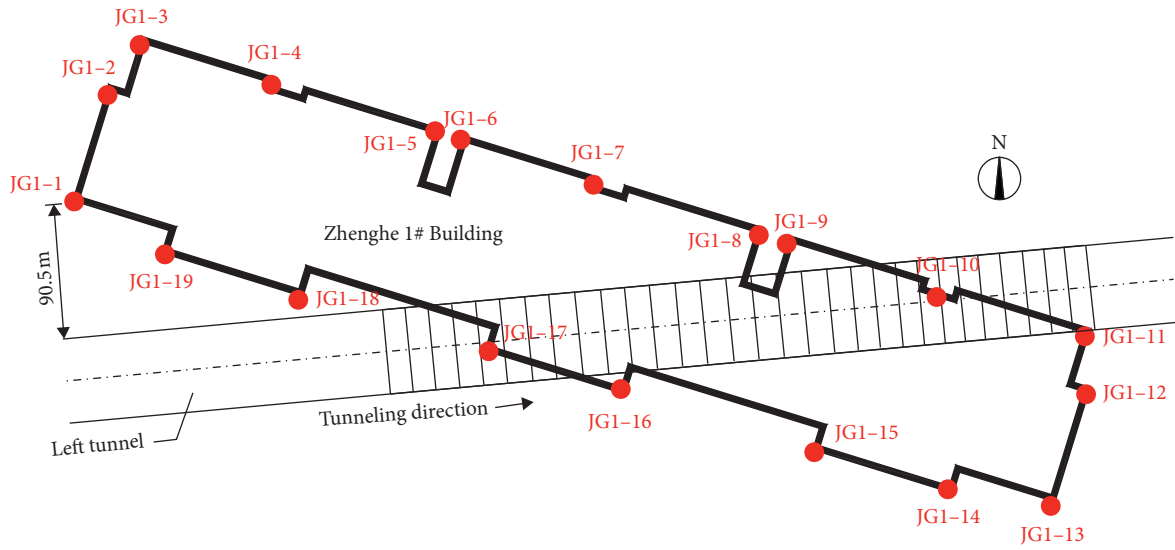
Layout drawing of the monitoring points in Zhenghe 1# building.
